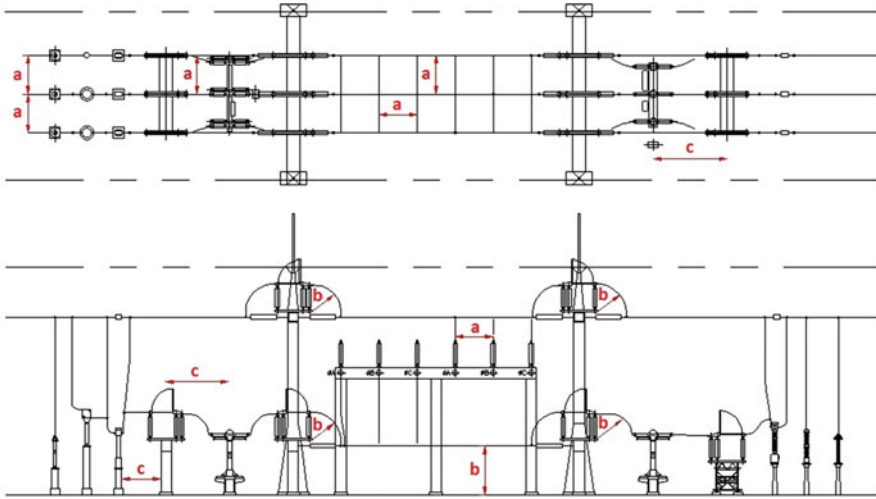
Double busbar circuit configuration, plan, and elevation drawing
